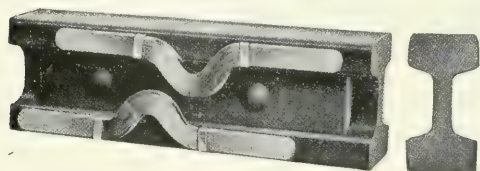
ELECTRICALLY WELDED BOND ON THIRD RAIL
